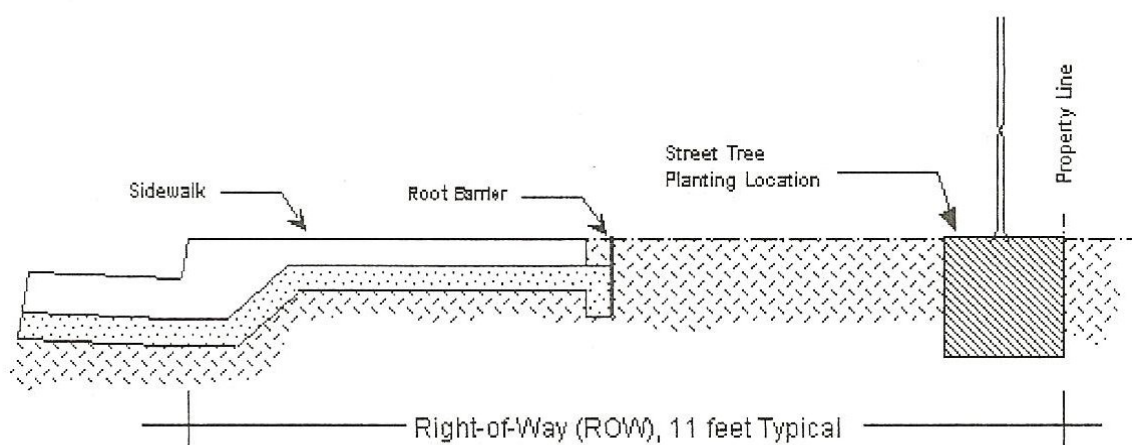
Tree planting diagram for monolithic sidewalk construction.
